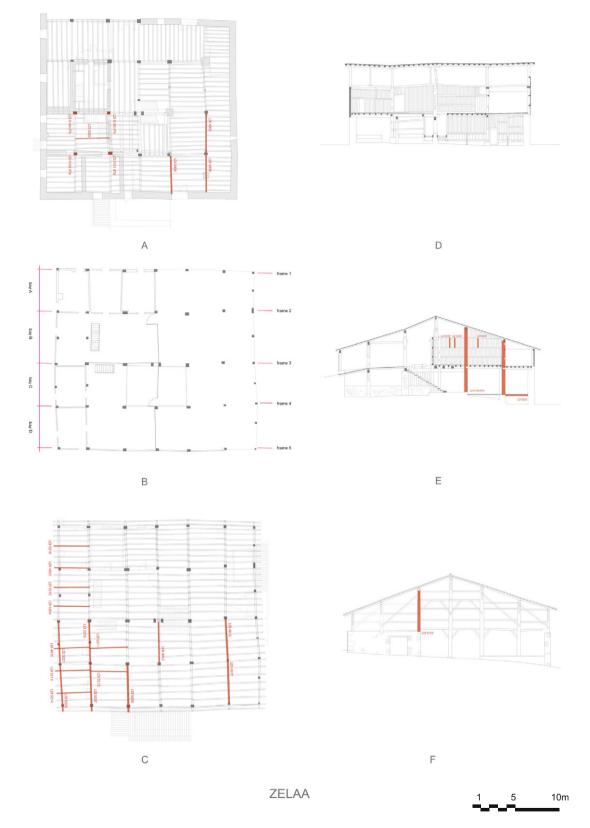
Zelaa farmhouse: a) ground floor, b) first floor, c) roof structure, d) longitudinal section, e) cross section, f) façade's frame. Bays and frames marked in pink at draw b). Dendrochronological samples marked in red at draws a), c), e), and f).
